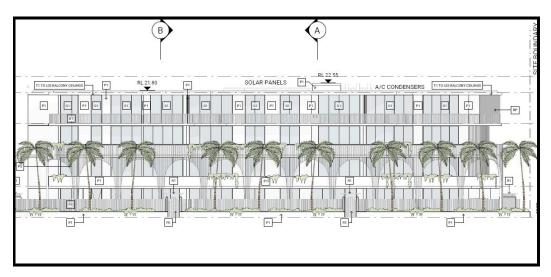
Approved development - PAMA -Grand Pde elevation (Source: NSW Planning Portal)
